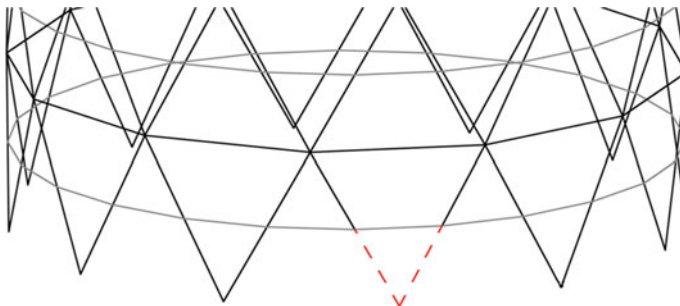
Structure with circular plan and straight elevation with a pair of diagrid elements removed from the ground floor level
